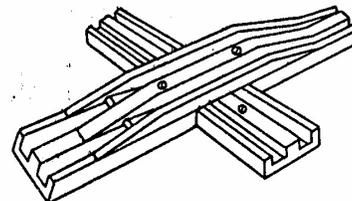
CROSS-JOINT OF CASINGS WITH BRIDGE
